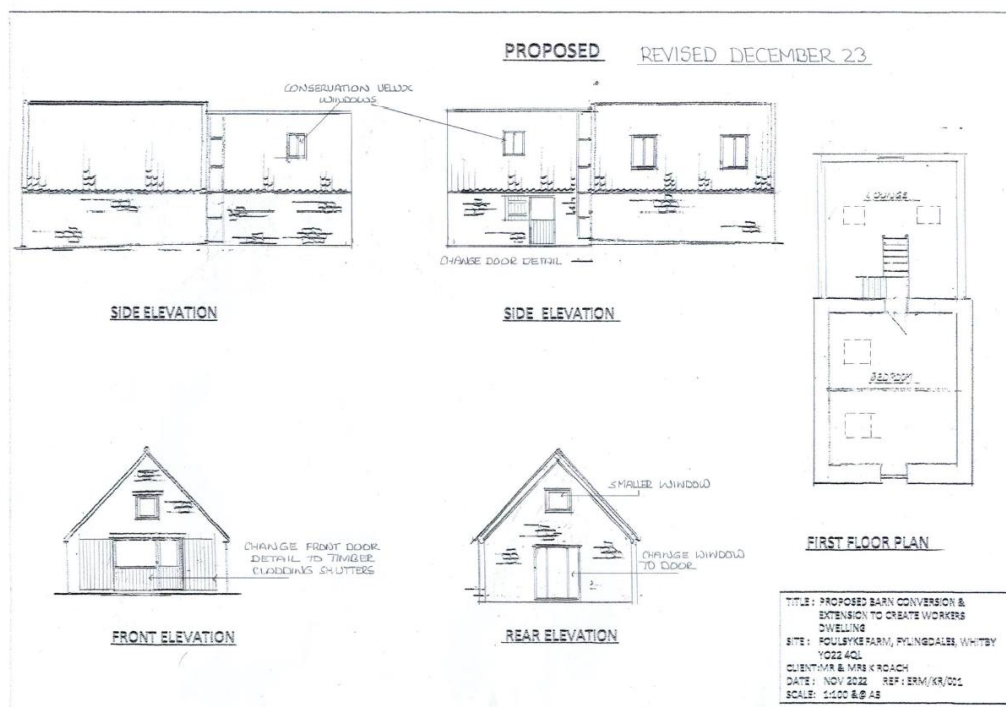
Plans for re-use of a traditional (curtilage listed) building.
